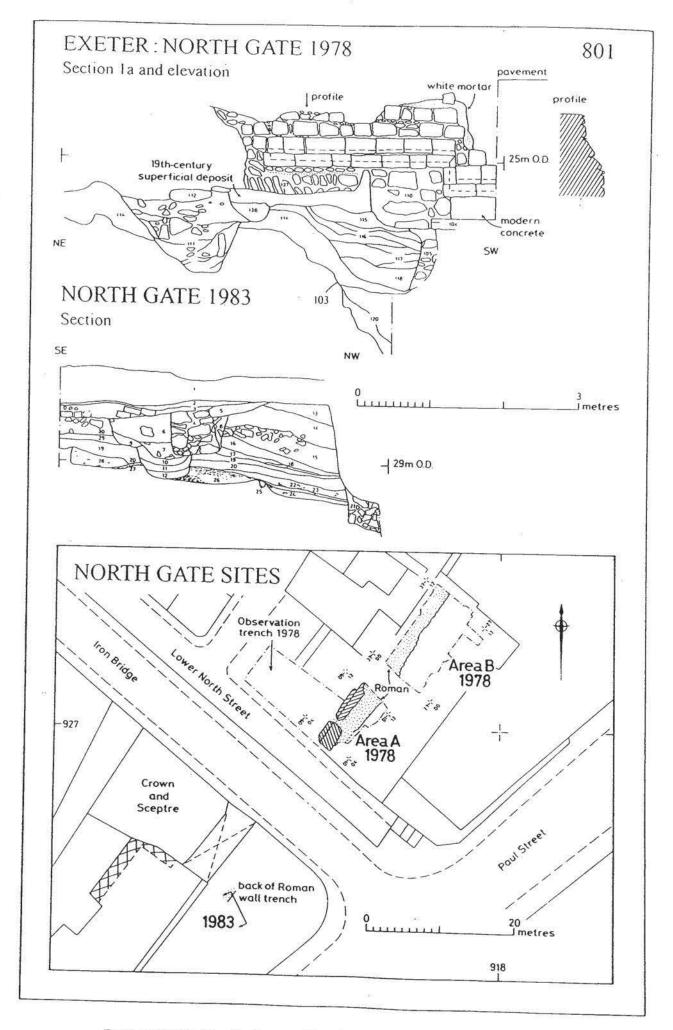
Section 1a shows the Roman military drainage? ditch (103), scale 1:50. Lower part shows a plan of the North Gate sites of 1978 and 1983, scale 1:500.
